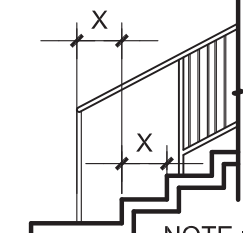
BOTTOM HANDRAIL EXTENSIONS AT STAIRS
